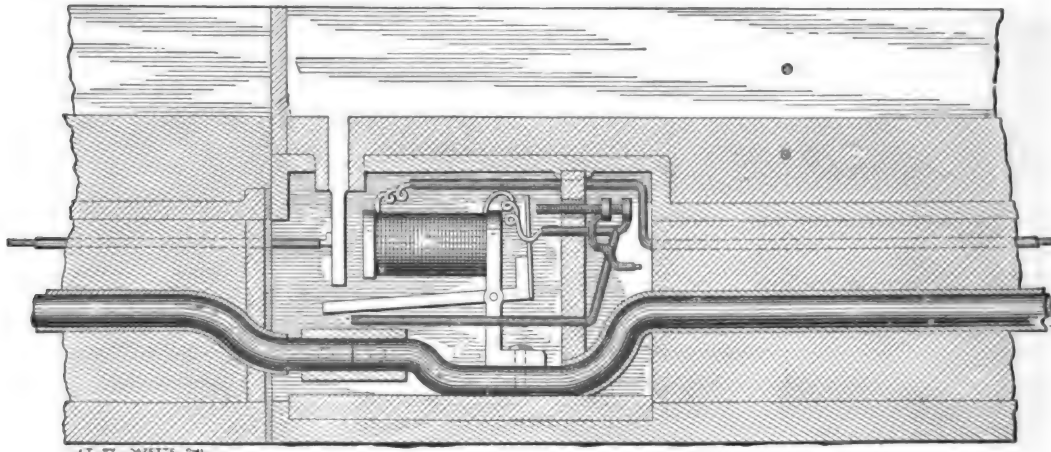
THE HARDING ELECTRIC RAILWAY CONDUIT.
